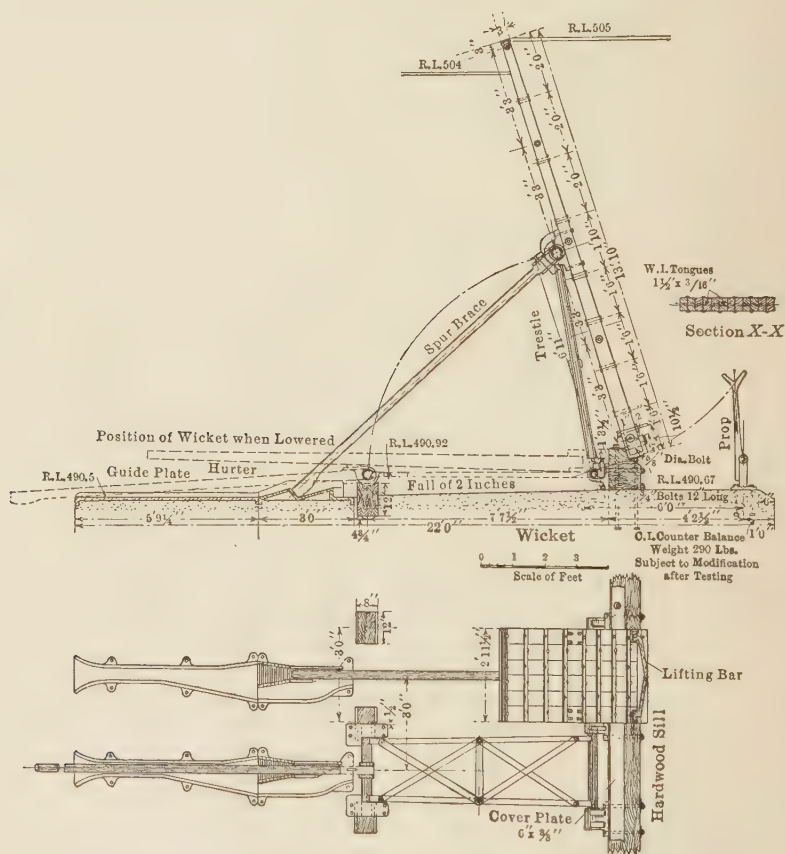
Details of Chanoine shutters used on diversion weir on Murrumbidgee River. New South Wales, Australia.
